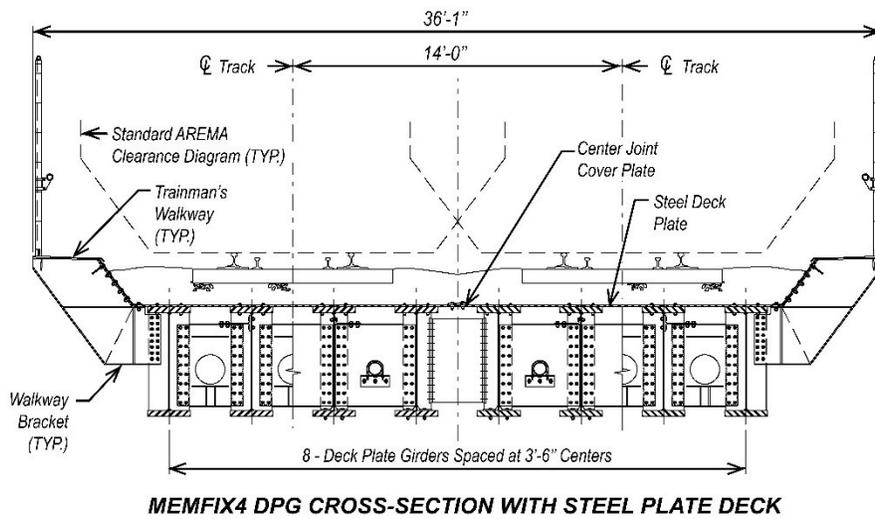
MemFix4 NSR bridge deck plate girder cross-section
